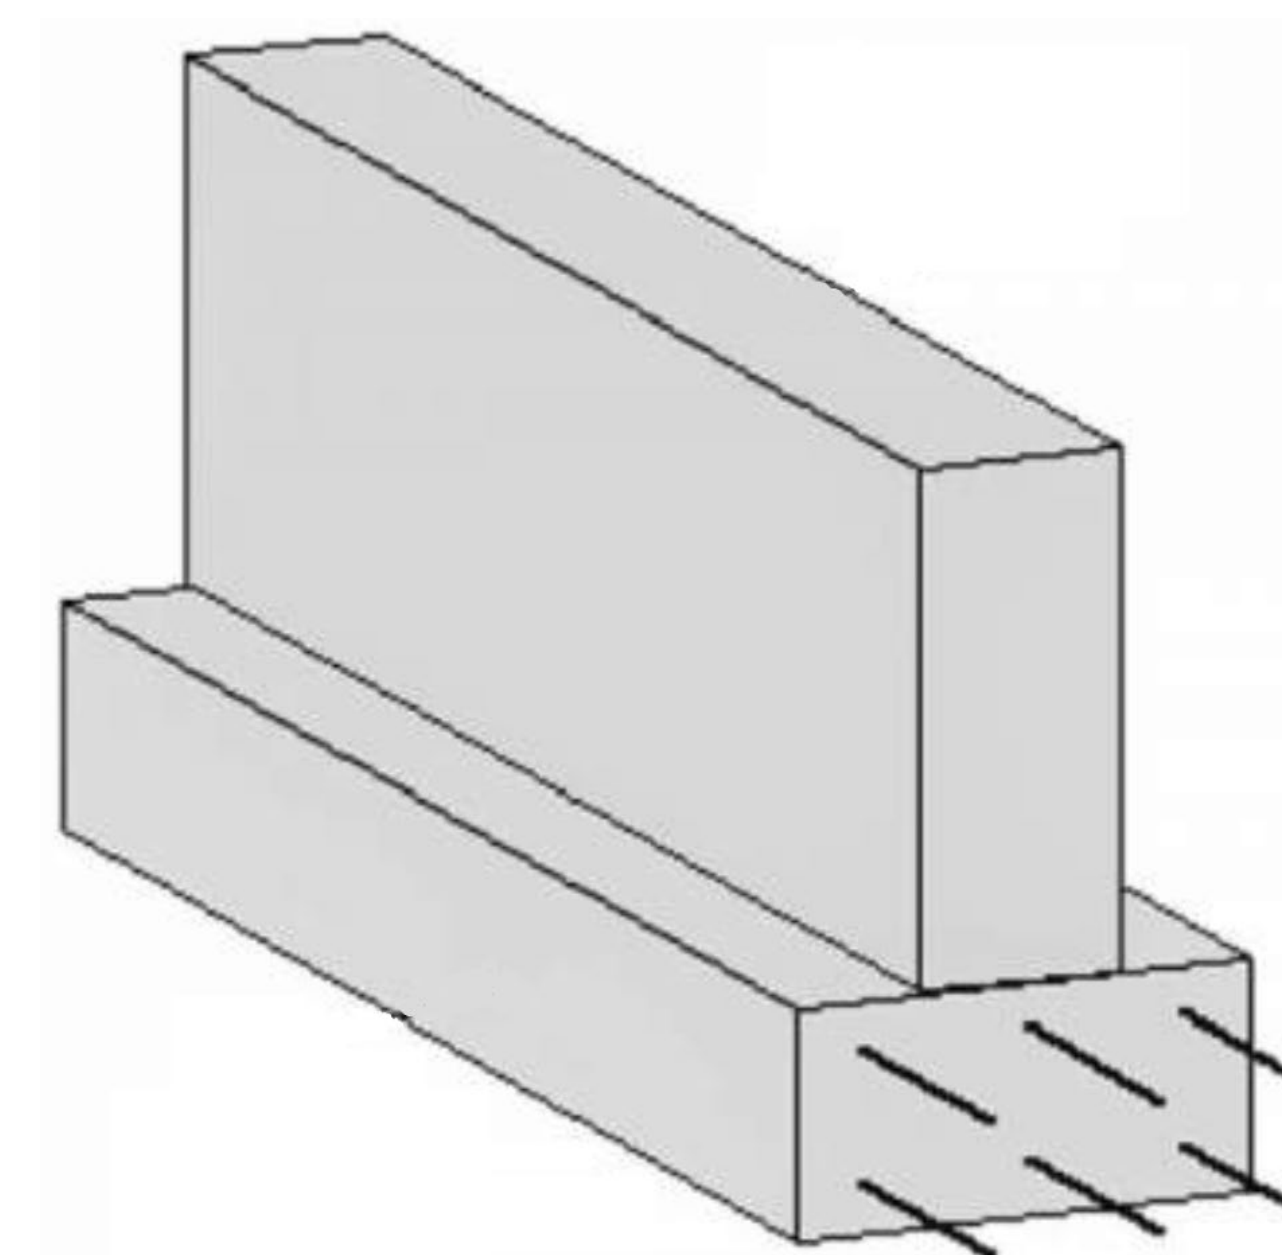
Shallow Footing – called for in the standard drawings. Very common cast in place concrete footing.
